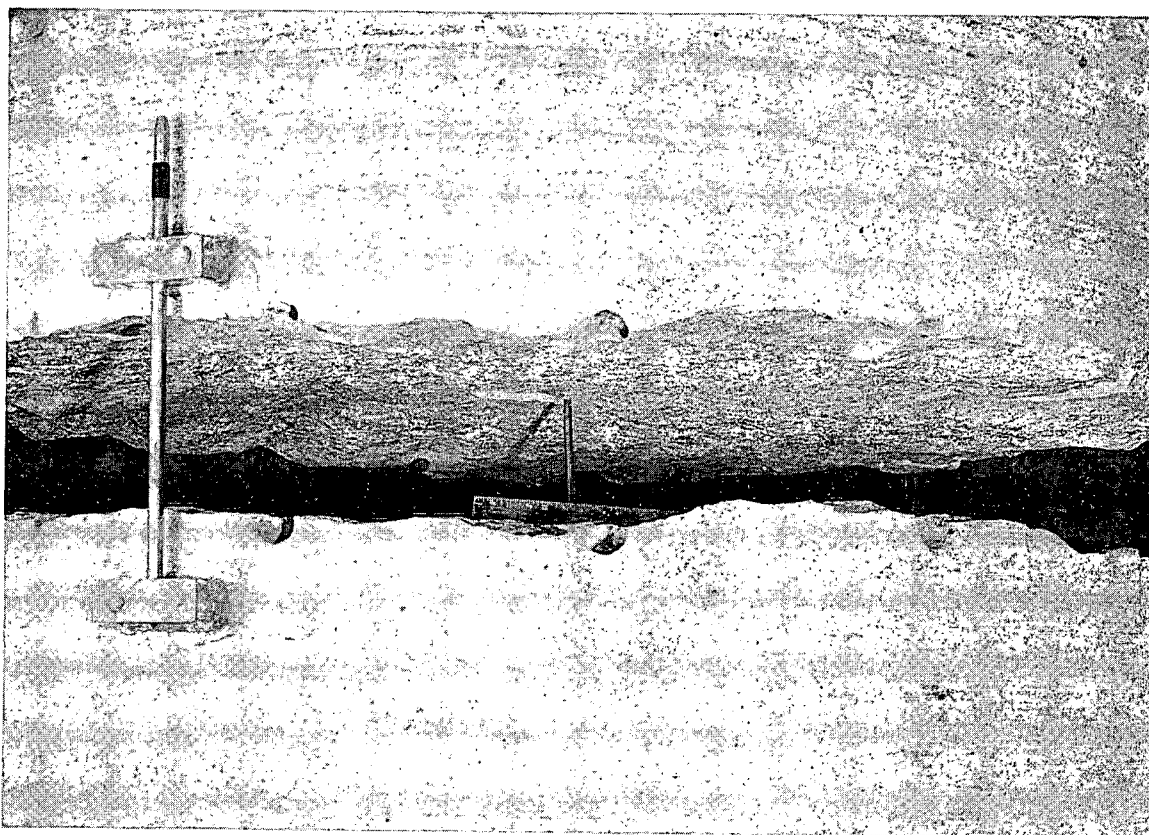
Tension fracture. Note the 6-in. scale resting on the fracture surface.
